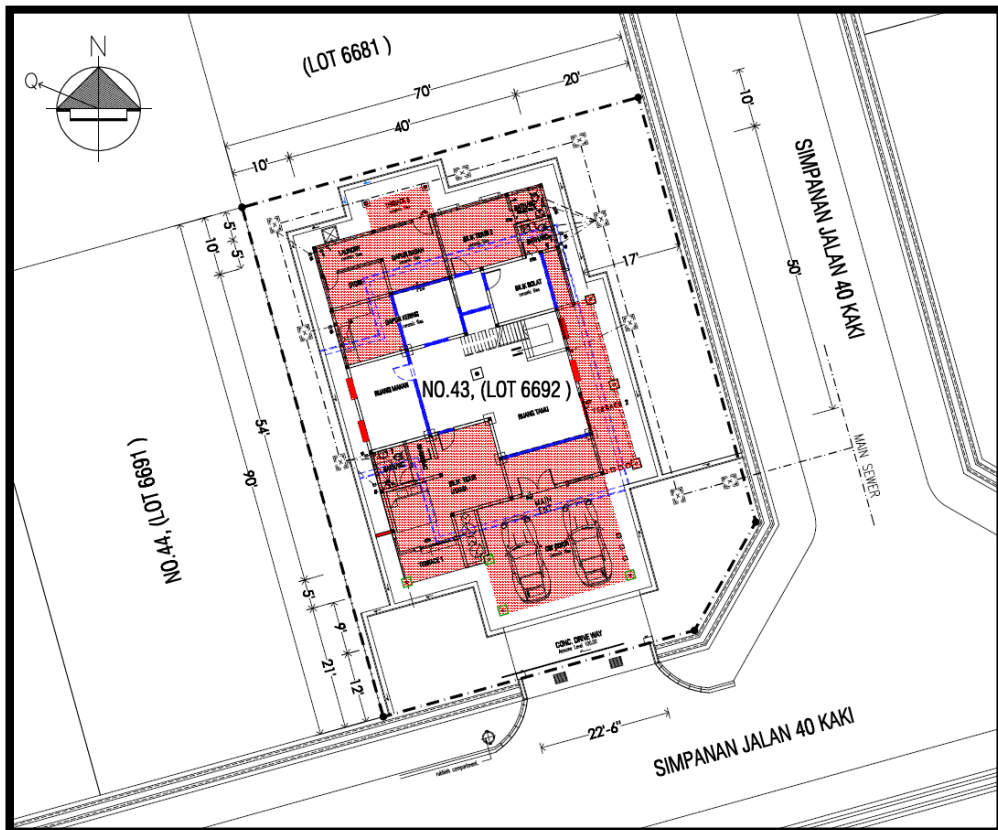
Site Plan (Scale: 1/16" to 1'0").
